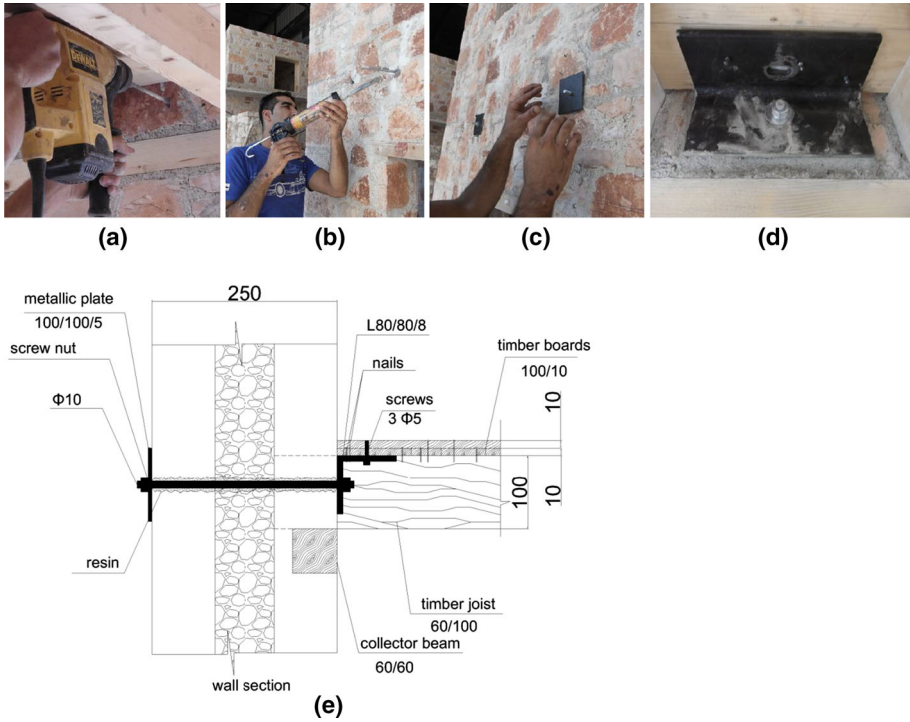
Construction details of the wall to timber floor connection. a Drilling the wall at floor level, b installing the chemical bolts, c–d placing the steel elements at both sides of the walls, e wall-to-timber floor connection (drawing)
